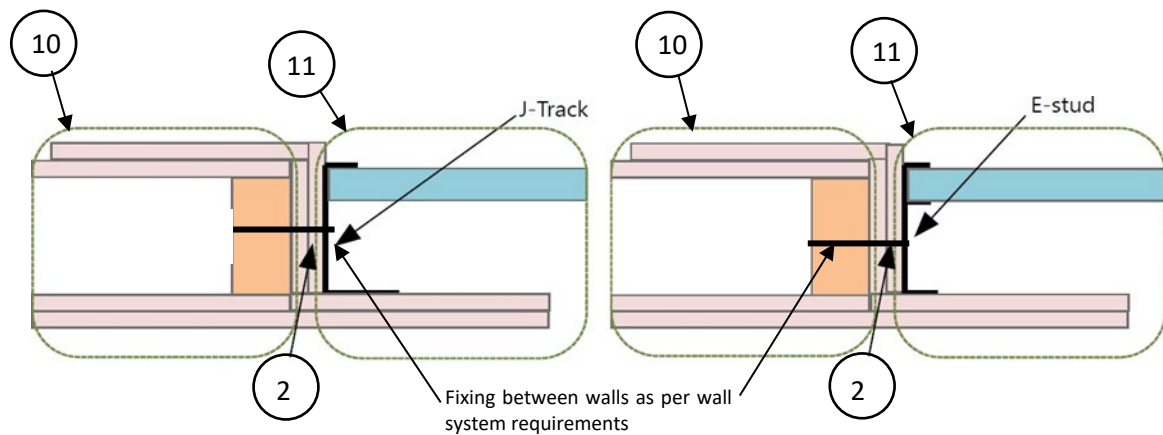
Steel stud shaft wall in parallel interface with single stud timber partition – Plan view
